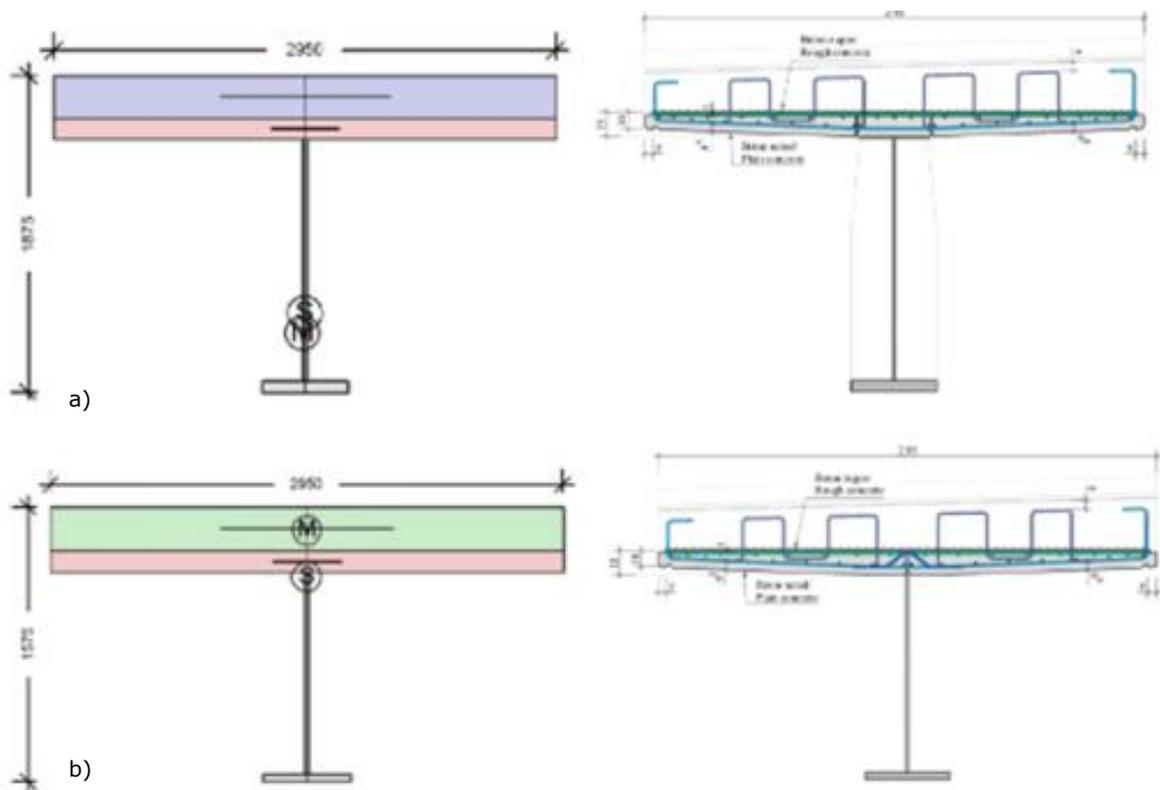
a) Cross section of the supports area; b) Cross section of the field.
